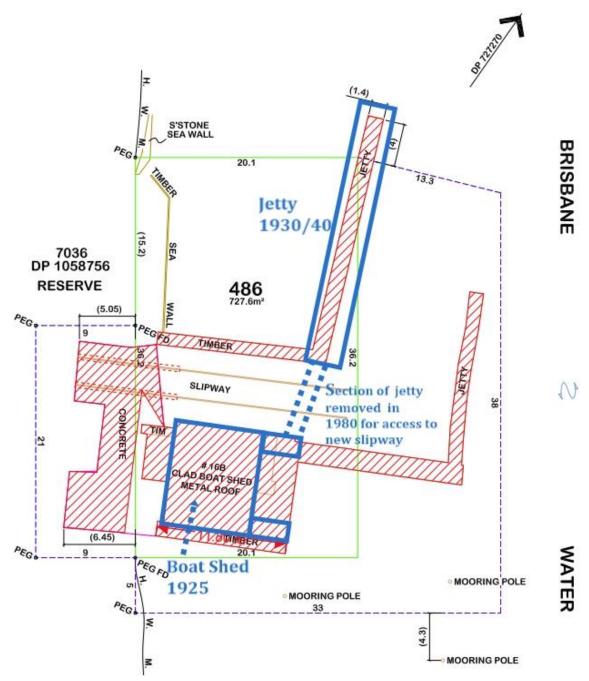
Plan of early footprint of the Empire Bay Boat Shed and jetty c1940.
